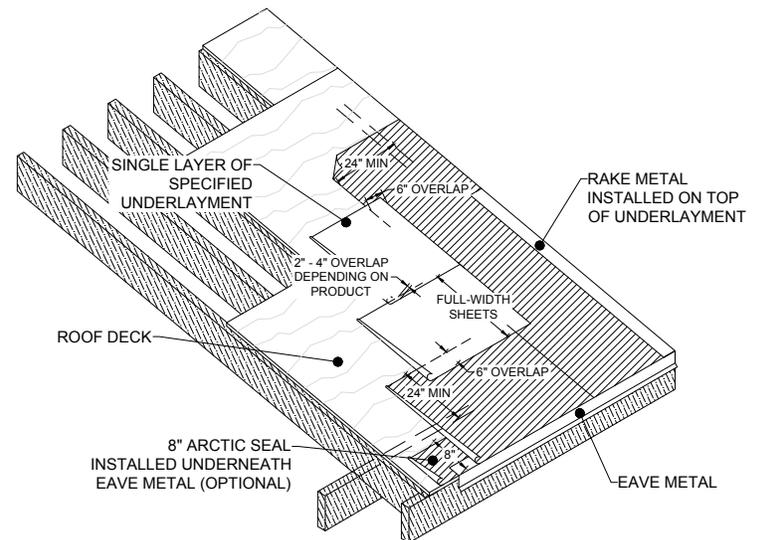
Application of Arctic Seal® for Ice Dam Protection, Roof Slopes 4:12 and Greater
